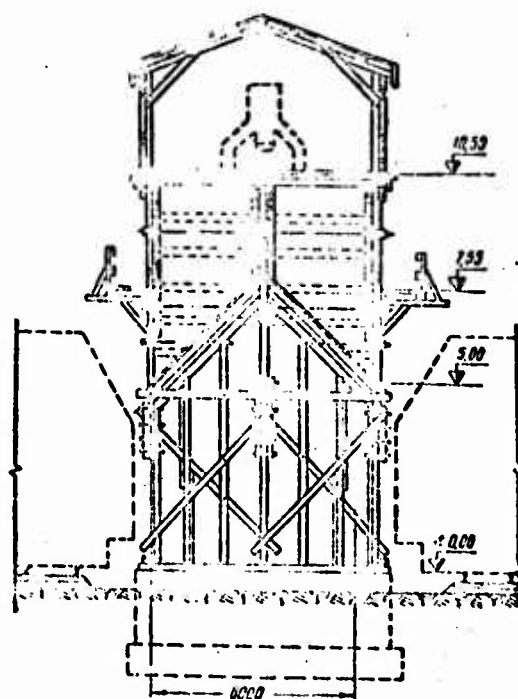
Double-sided wooden loading hopper with lateral loading of loose material.
